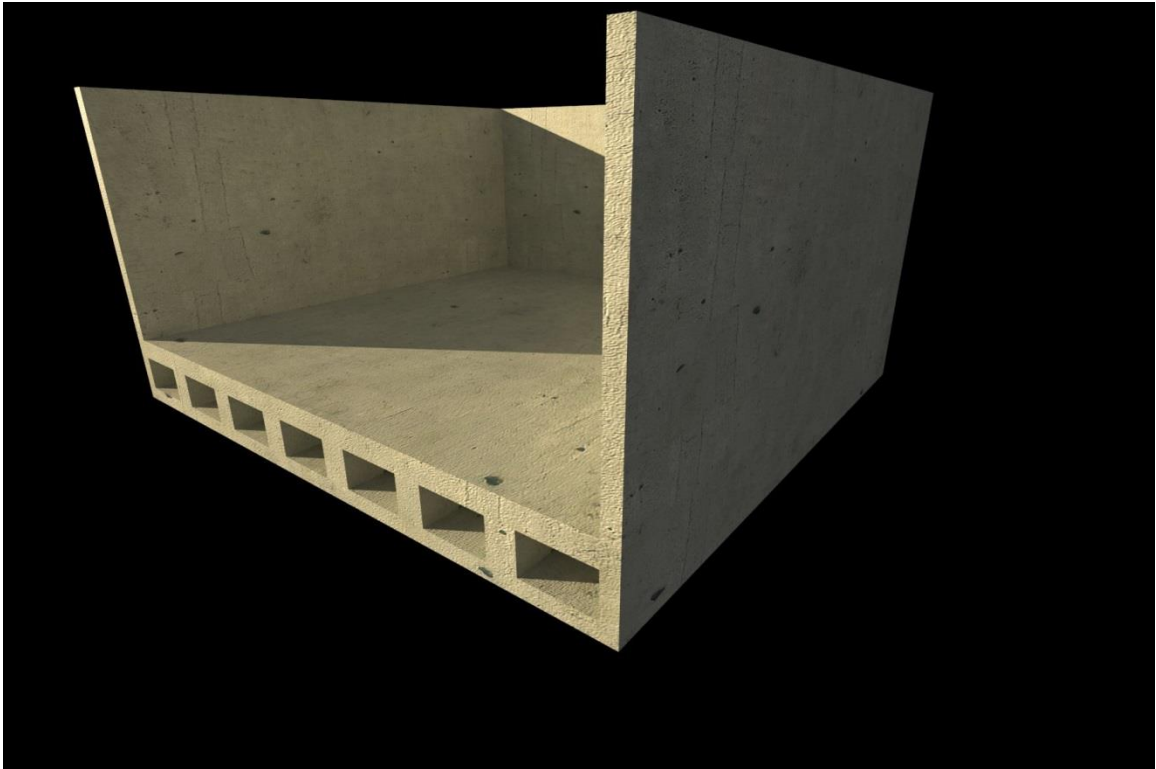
(cross section of a light weight concrete caisson showing hollow cores)
